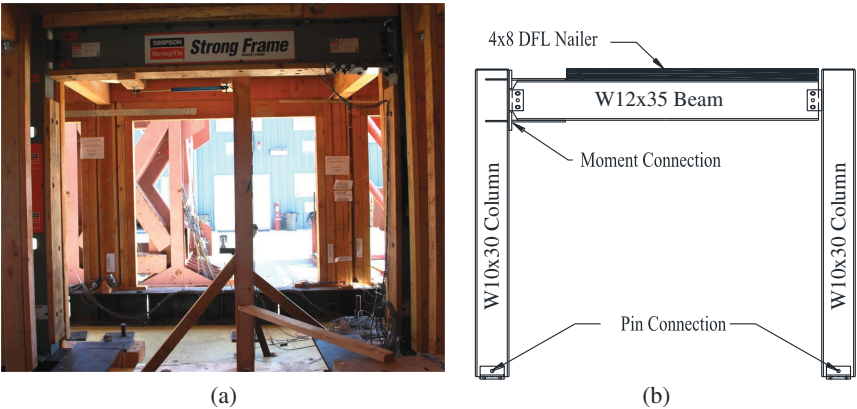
Steel SMF: (a) frame installed in ground story; (b) elevation views and design details
